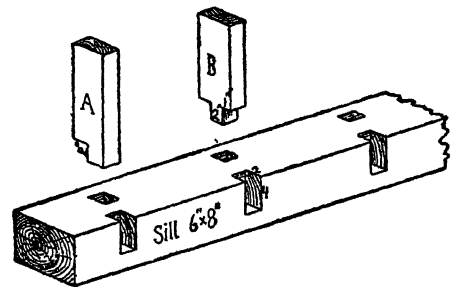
MORTISED FOR TENONED STUDS AND NOTCHED FOR FLOOR JOINTS.
